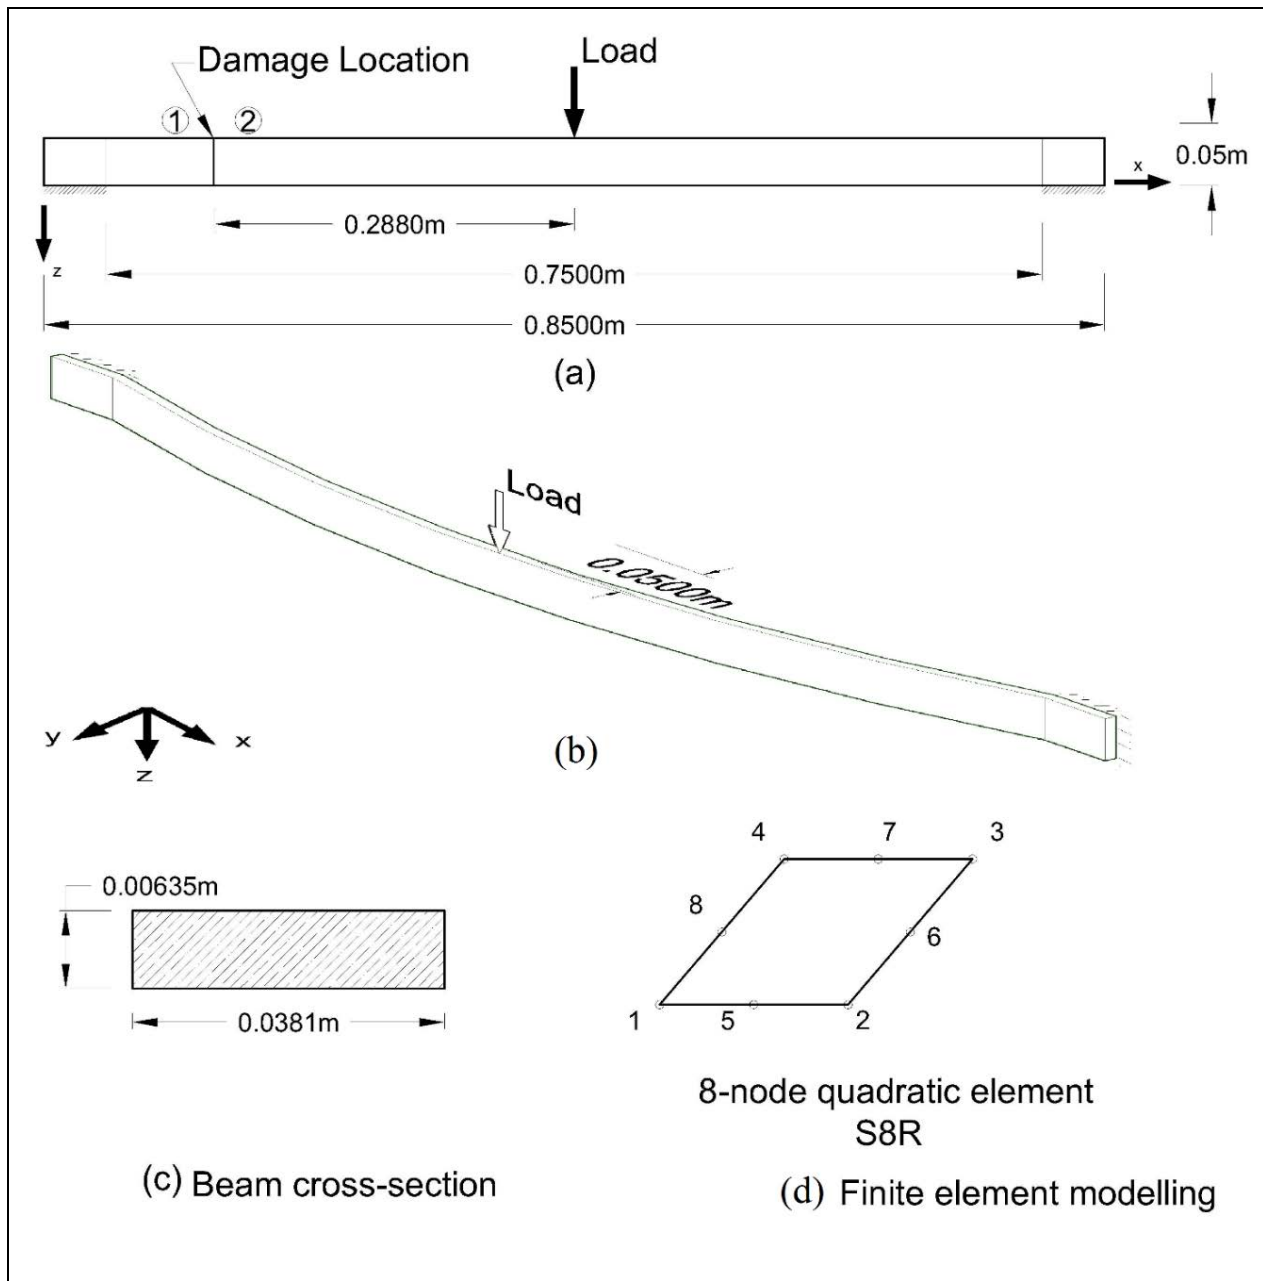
(a) Front layout schematic representation of the fixed-ended beam, (b) isometric view of the horizontally curved beam with 0.05 m chord height, (b) dimension of the cross-sectional area of the beam, and (d) finite element beam model used in the analysis.
